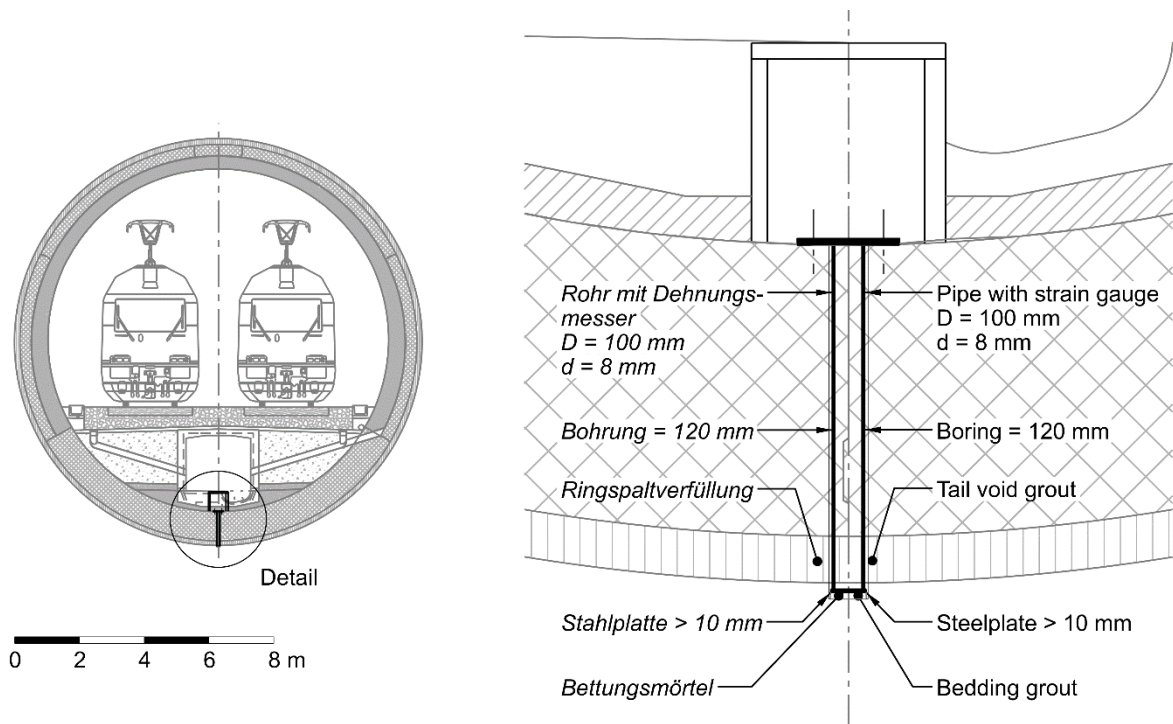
Stress measurements in the Adler Tunnel with a steel plate fixed to a steel pipe and the tunnel lining (Sambeth, 2024 and Chiaverio, 2024). In one measurement section five stress measurement devices are installed along the tunnel, spaced one meter in the same area.
